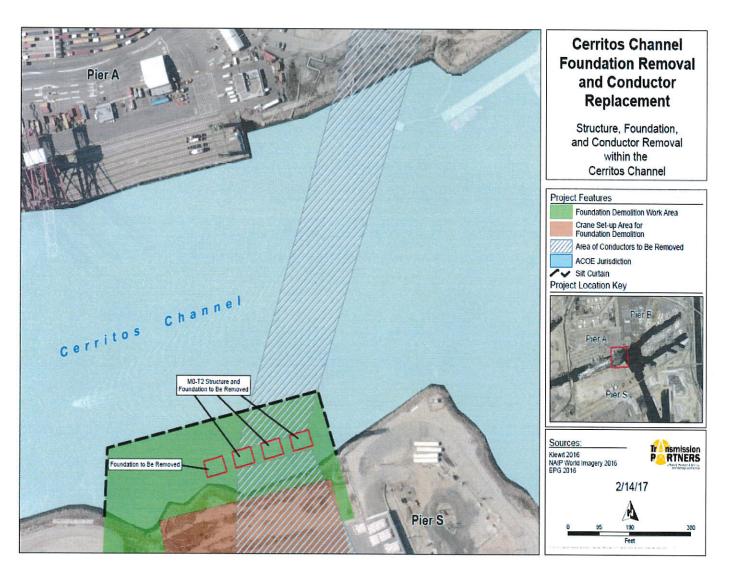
Proposed Structure, Foundation, and Conductor Removal
